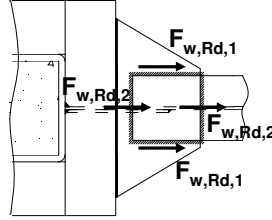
Capable forces of the fillet welds between beam flange and cover plate
